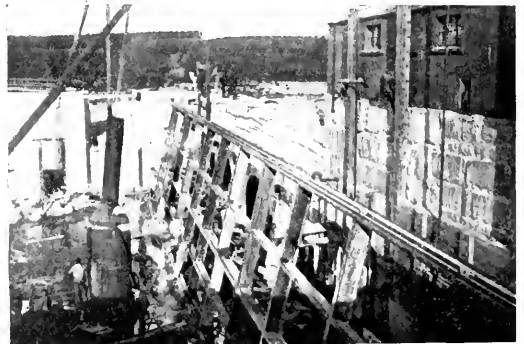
RACK AND FOUNDATION FOR ADDITION TO GARVIN'S FALLS POWER STATION.
